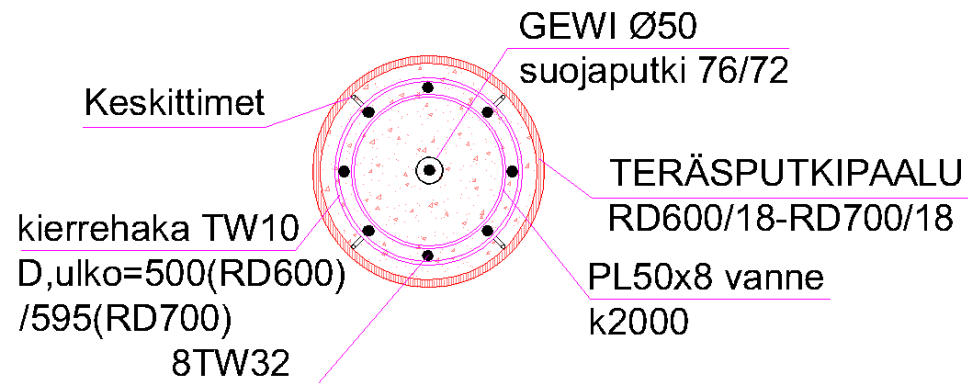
Anchor details for pile experiencing less than 600 kN of tension force.
